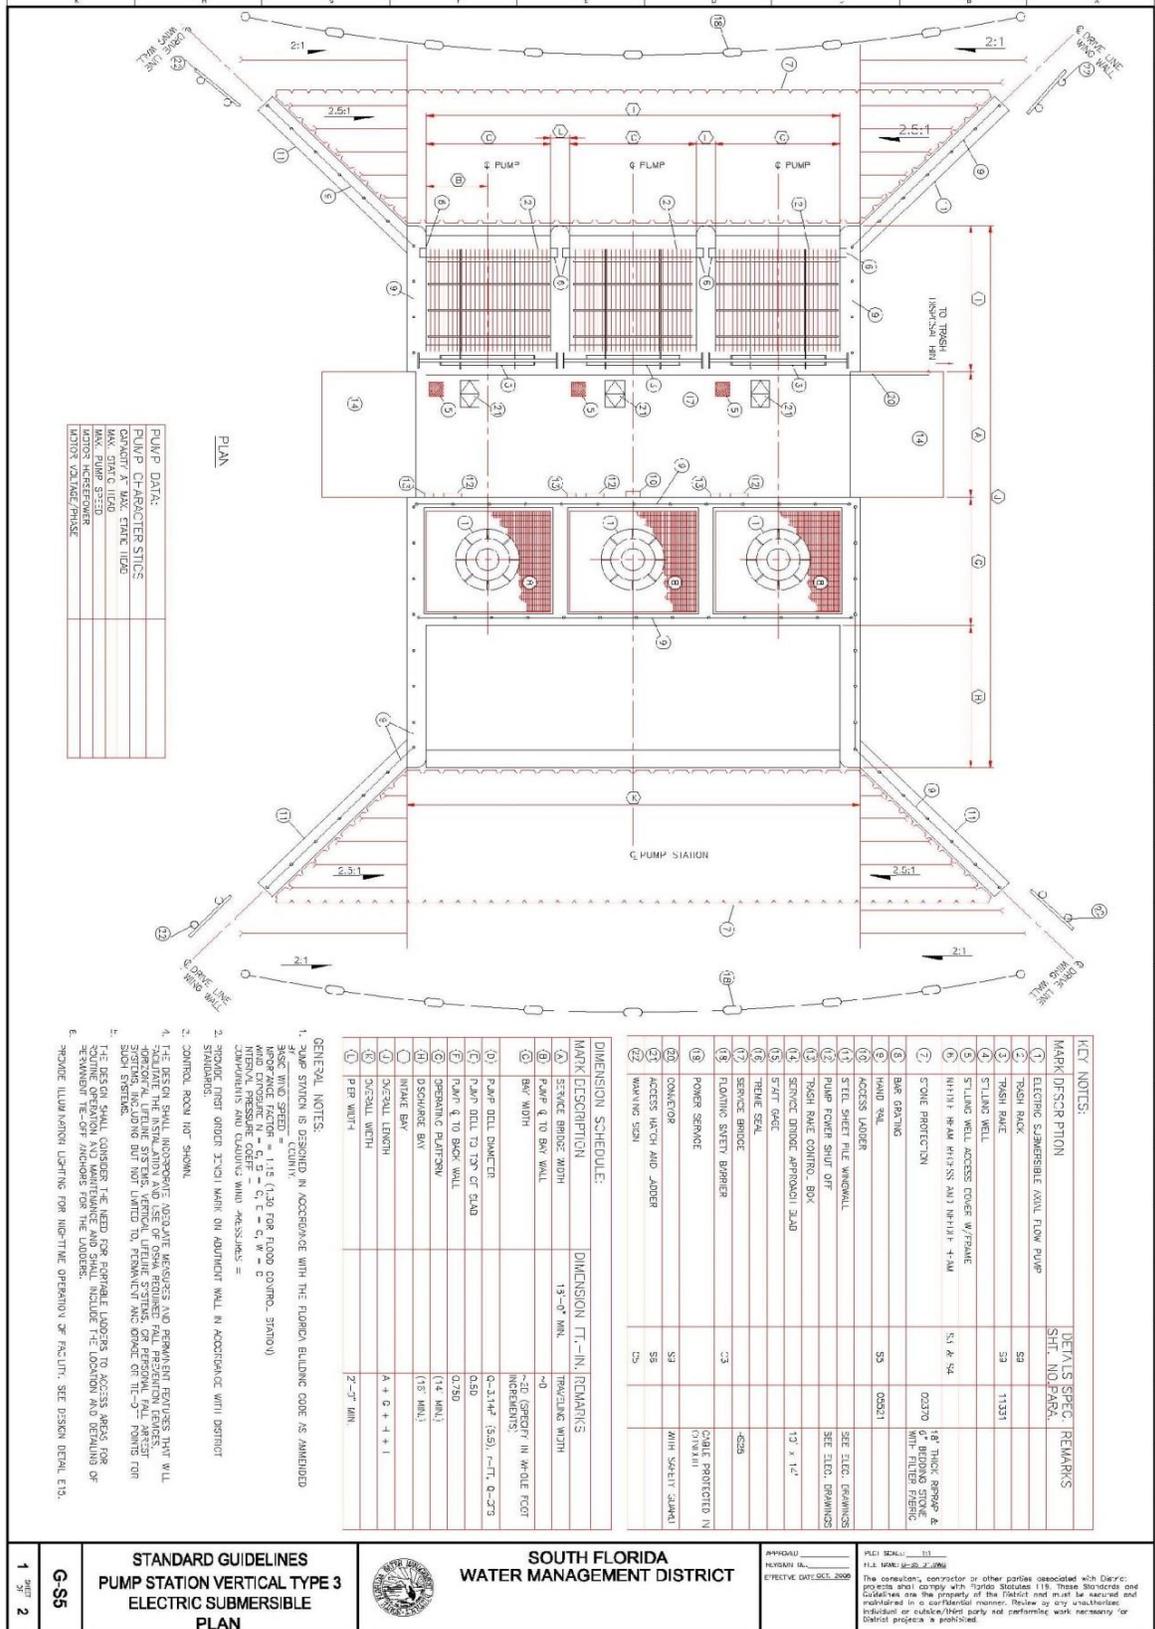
Standard Guidelines: Electric Pump Station, Vertical Type 3 Submersible Plan
